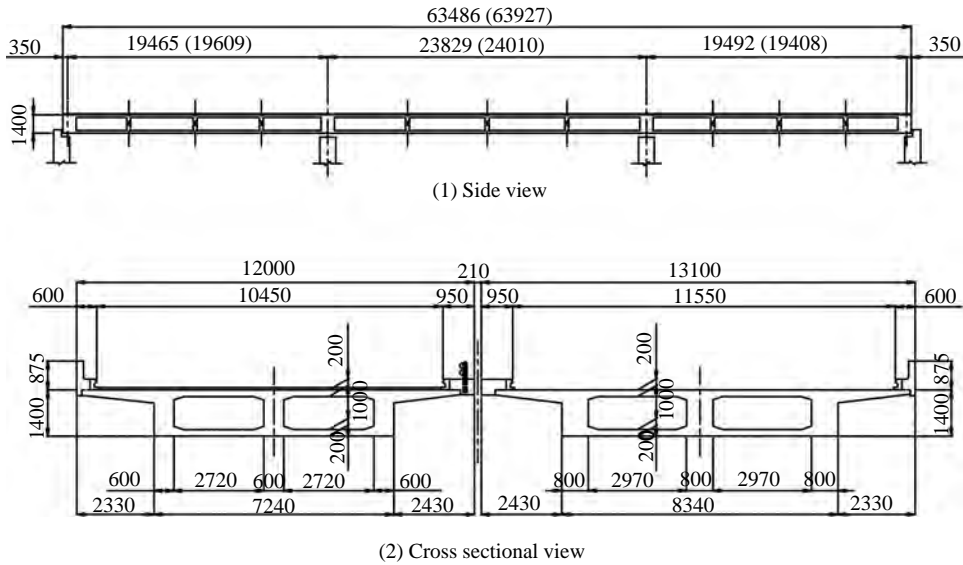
General view of the Chofu Bridge (unit:mm)
